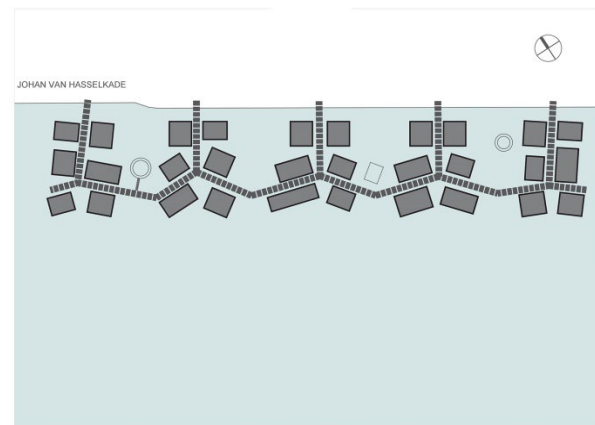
Scheme of the site plan of the Schoonschip neighbourhood (author)
